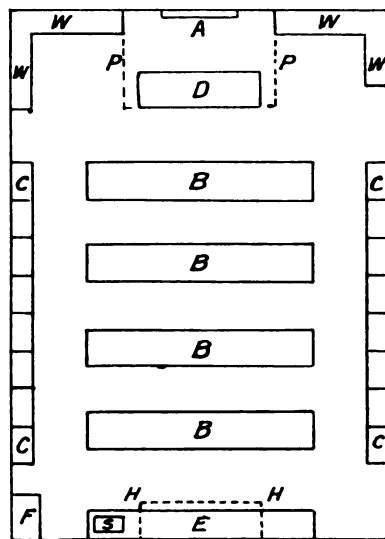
A. Blackboard, &c. WW. Wall space for storages, Cupboards and Wall apparatus. PP. Platform. E. Bench for general apparatus. HH. Hood over part of E. S. Large sink. F. Blowpipe bench.
